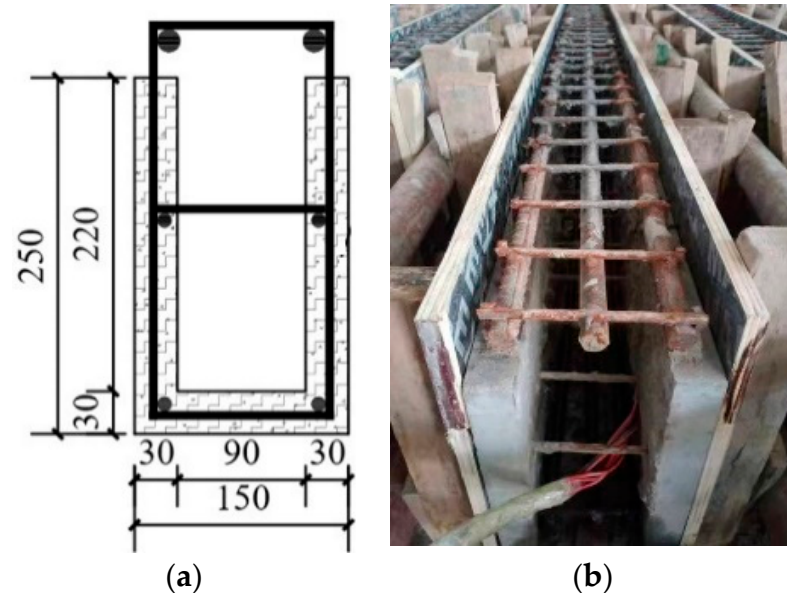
Diagram of the specimen manufacturing process: (a) shell cross-sectional dimensions; (b) the prefabricated shell.
